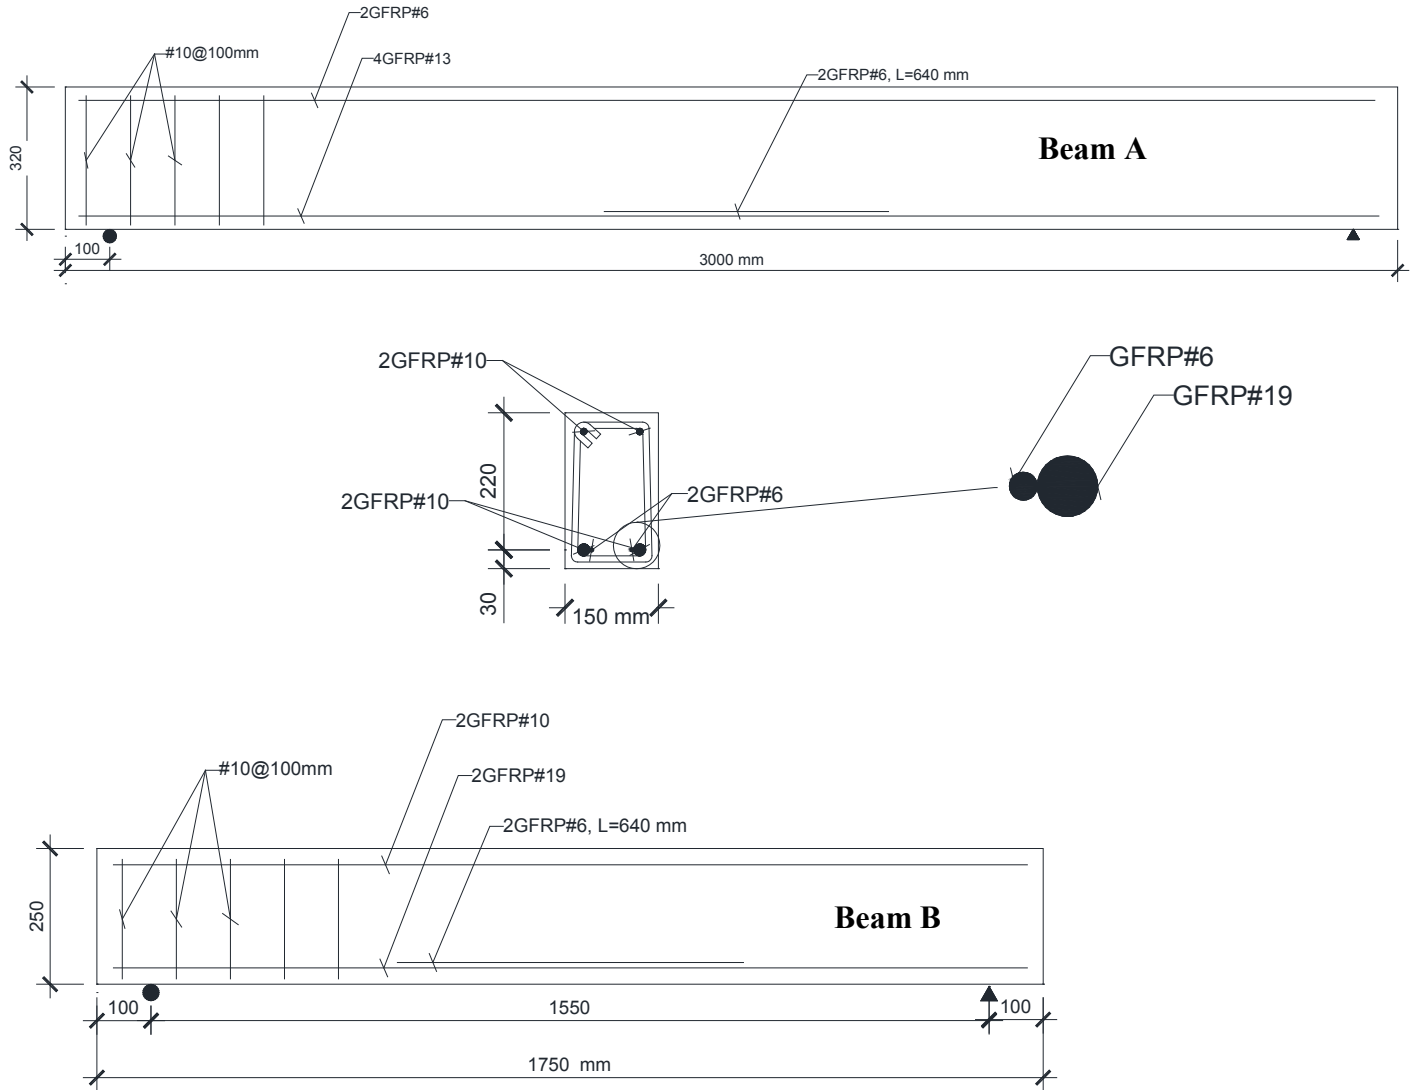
Specimen size and reinforcement details of Beam A (Torkan, 2010) & Beam B (current study)
